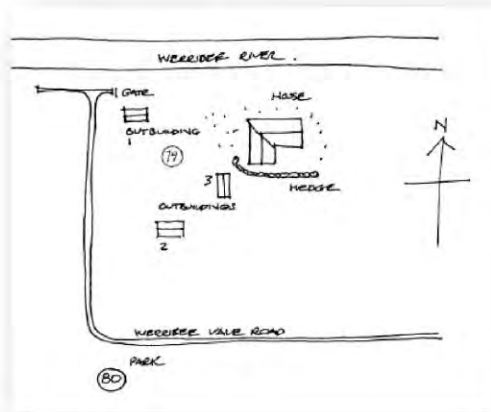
Errindale Farmhouse, 520 Werribee Vale Road MADDINGLEY (Peterson 1994)
